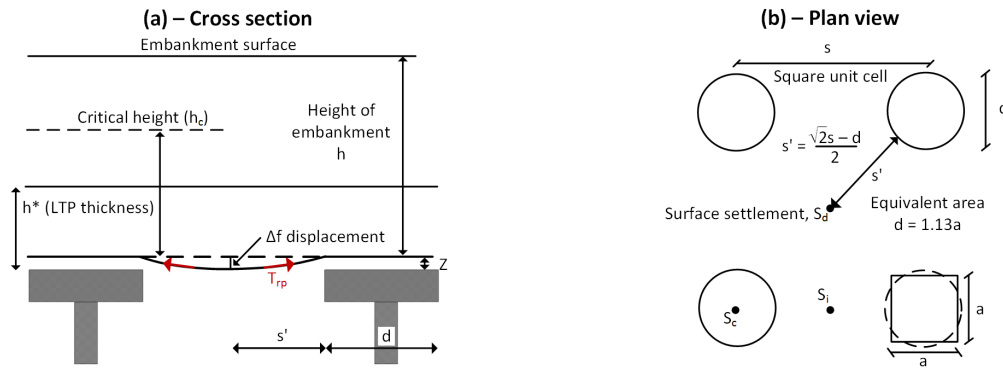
Embankment geometry (a) cross section and (b) plan view
